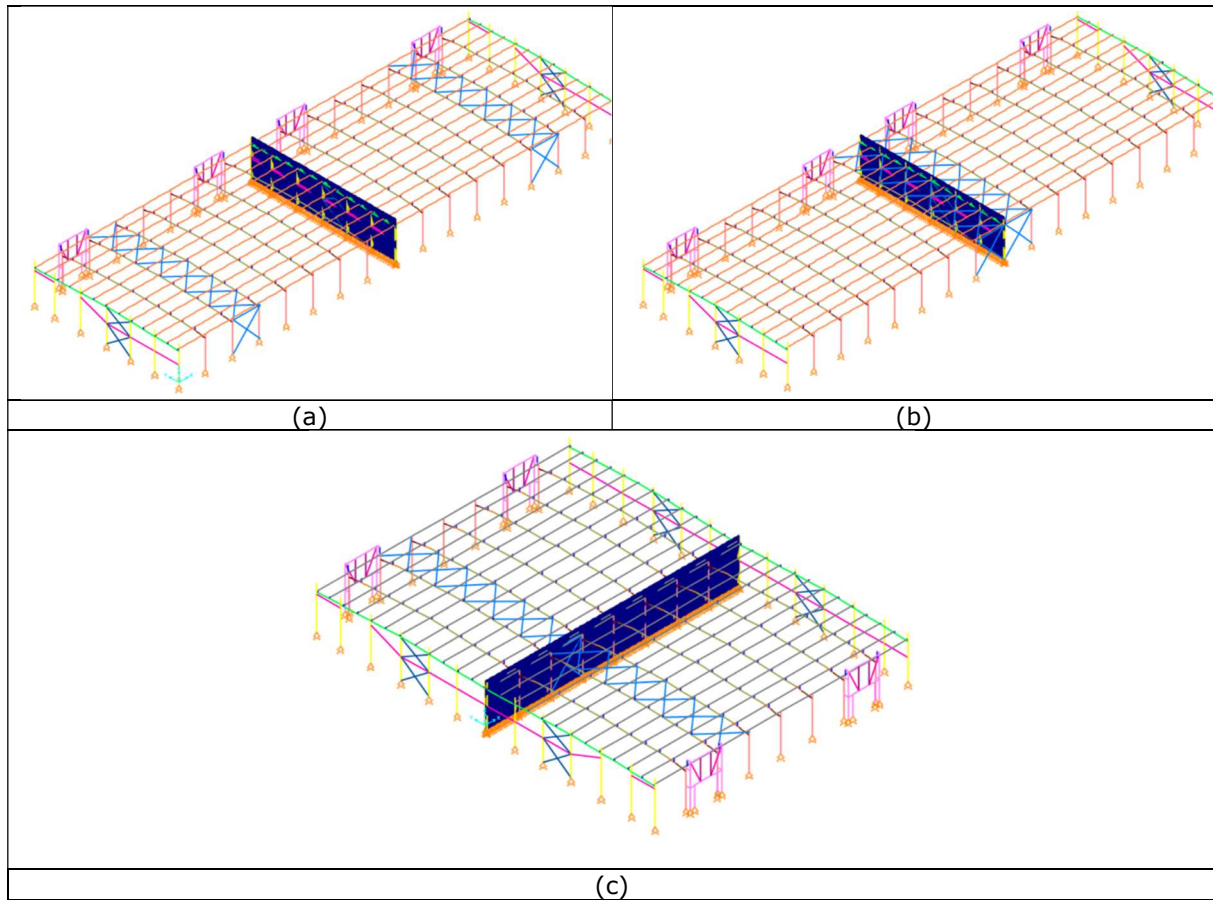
Configurations analysed: a) fire wall parallel to portal frames and actual position of bracing system; b) fire wall parallel to portal frames and bracing system near the fire wall; c) fire wall orthogonal to portal frames
